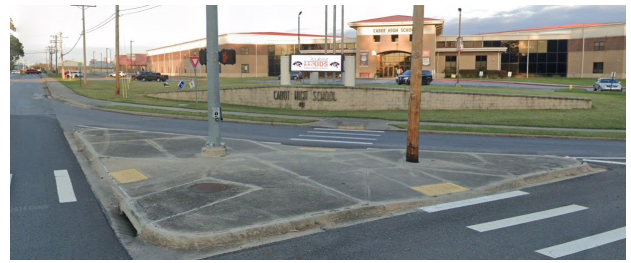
Northeast corner of the intersection of Pine Street and Lincoln Street. (Photo from Google Street View November 2024)
